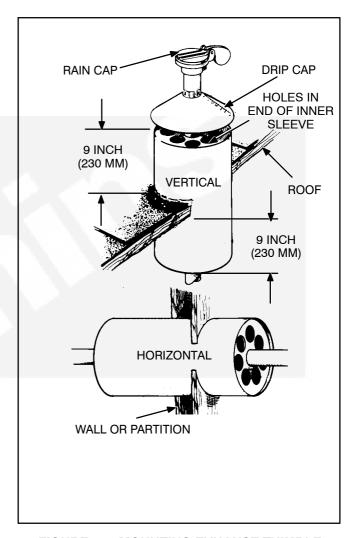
MOUNTING EXHAUST THIMBLE
